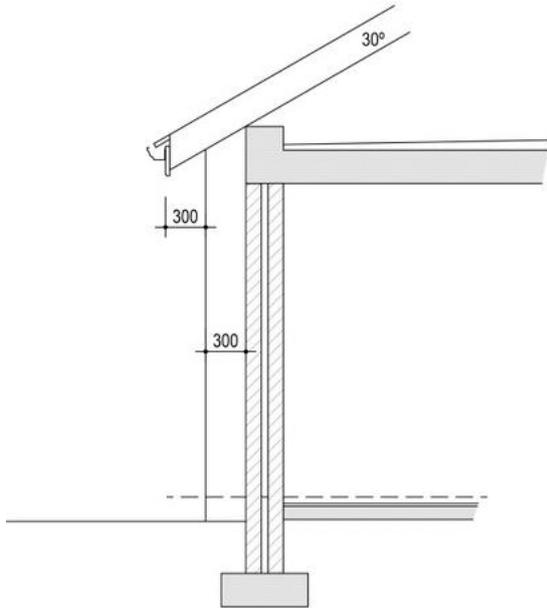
Detail section of the relationship between parapet and barge board as indicated on Figure 16.
